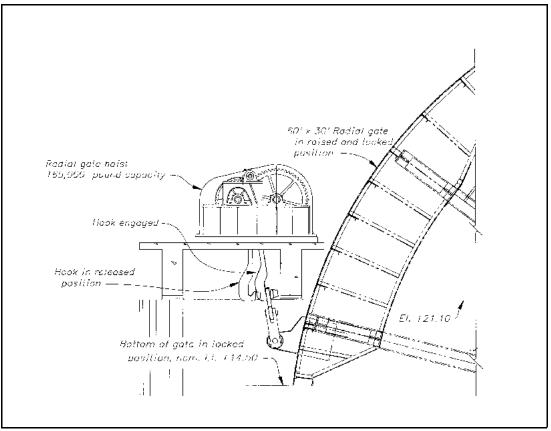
Sectional elevation showing gate, hoist drum unit, and gate lock installation.
